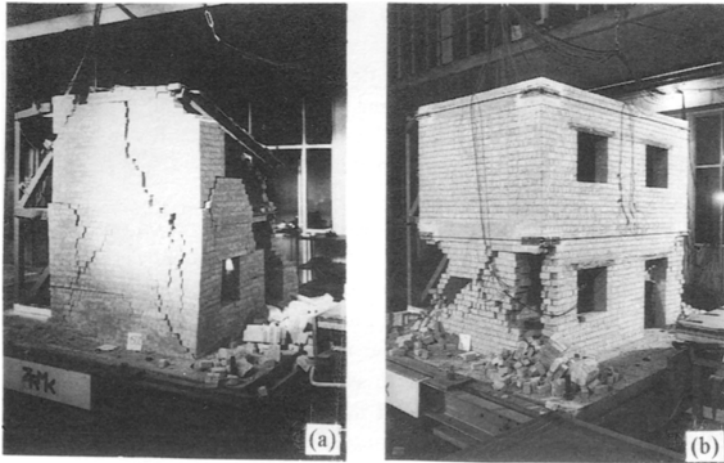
Mechanism of collapse of brick-masonry model without (a) and with steel ties at floor levels (b).
